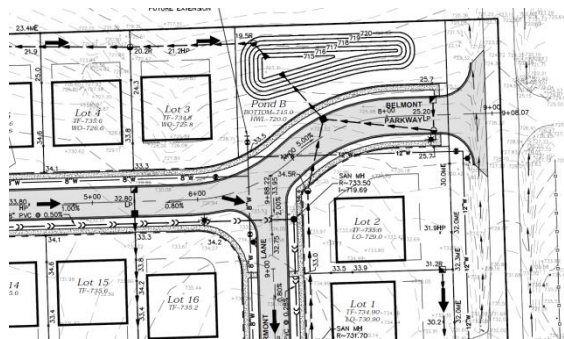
The approved Preliminary PUD Engineering plans indicating detention pond B near the Bell Road entrance.
